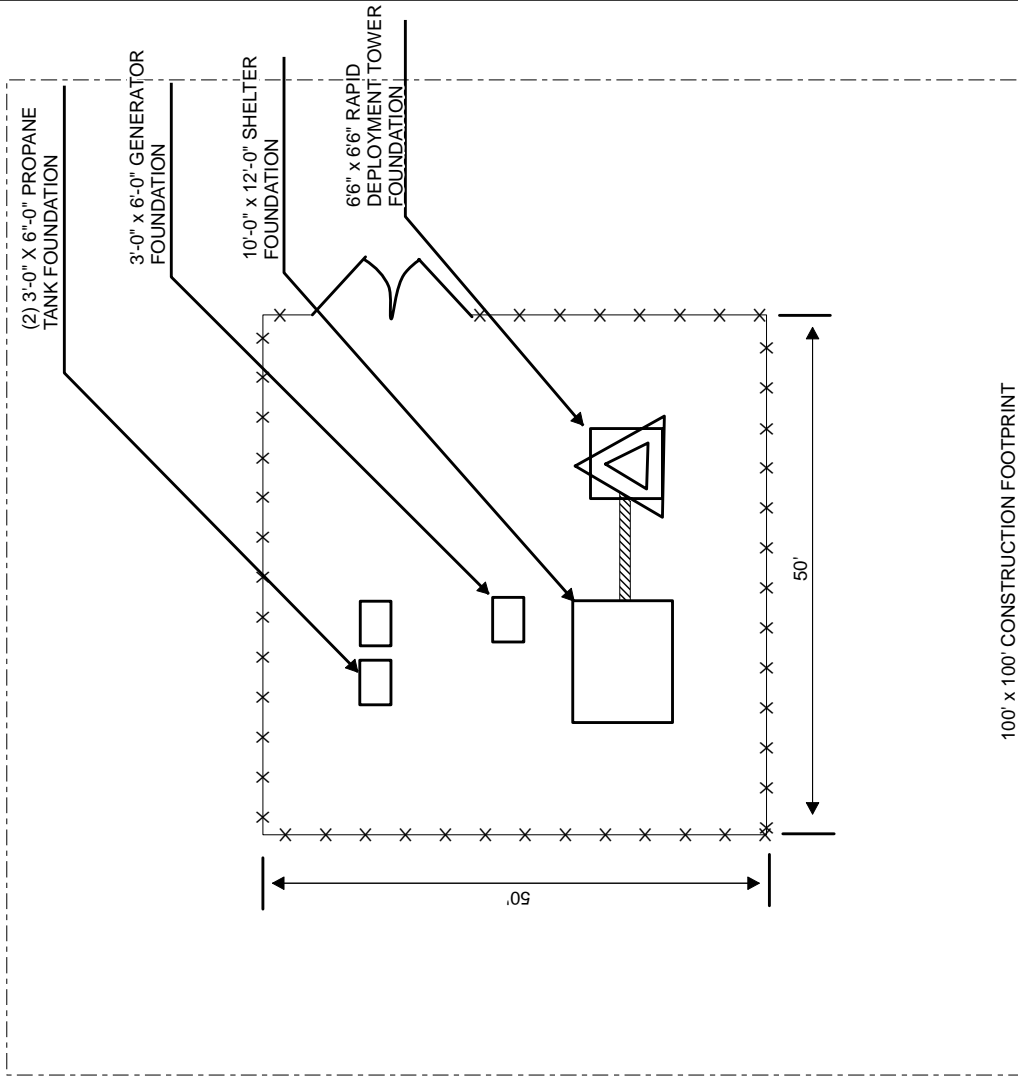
RDT Stacking Slab Tower Foundation Schematic
